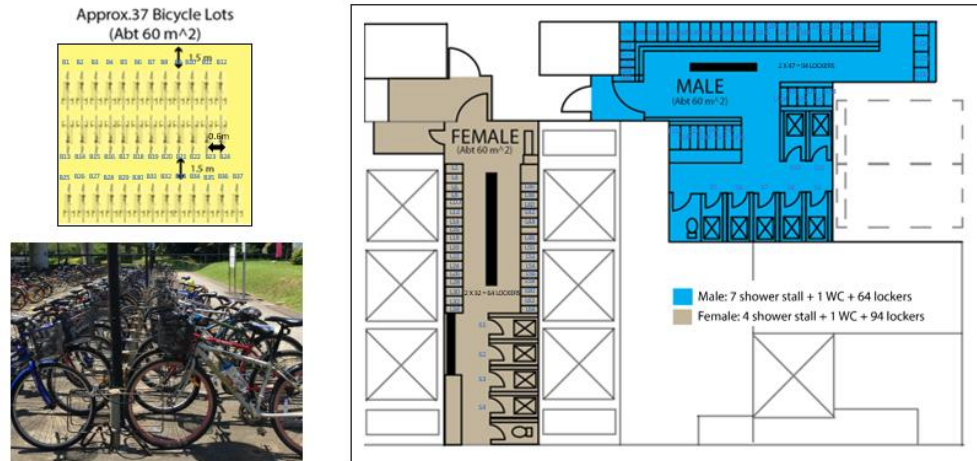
Example of a Bicycle Parking and End-of-Trip Facility Plan detailed zoom in Plan
